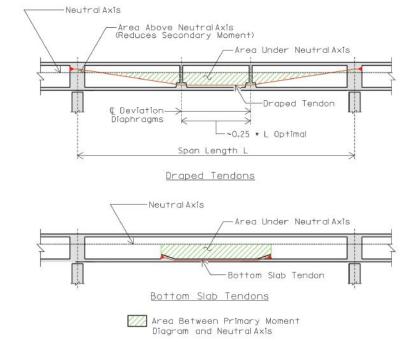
Continuity post-tensioning tendon layout for a constant-depth concrete segmental bridge constructed using the balanced-cantilever method.
